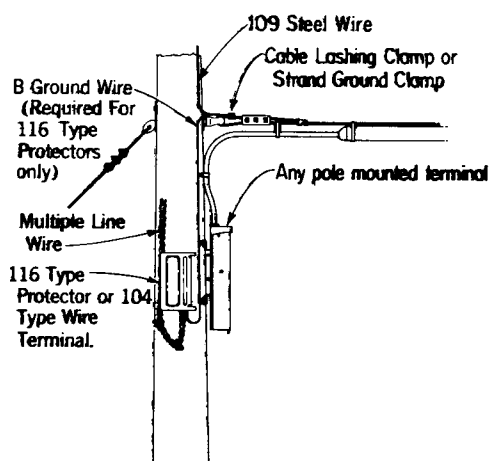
Deadend Pole With Pole-Mounted Cable Terminal
